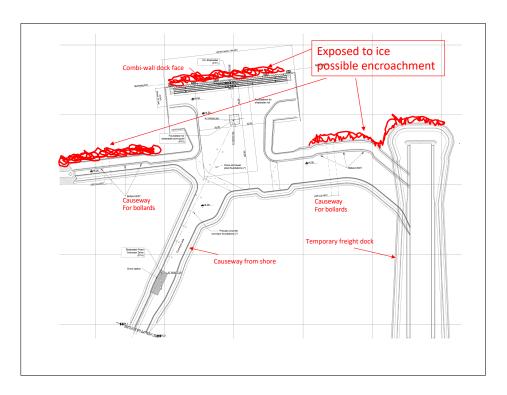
Faces/causeways exposed to potential ice encroachment
